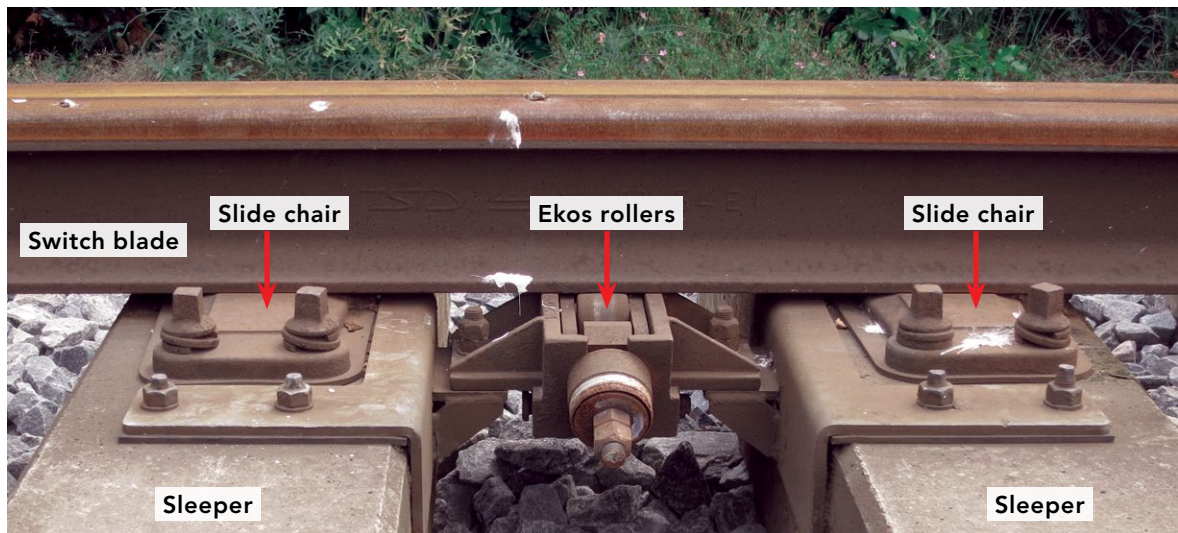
This photograph shows the parts supporting the switch blade, consisting of slide chairs and Ekos-V rollers.
